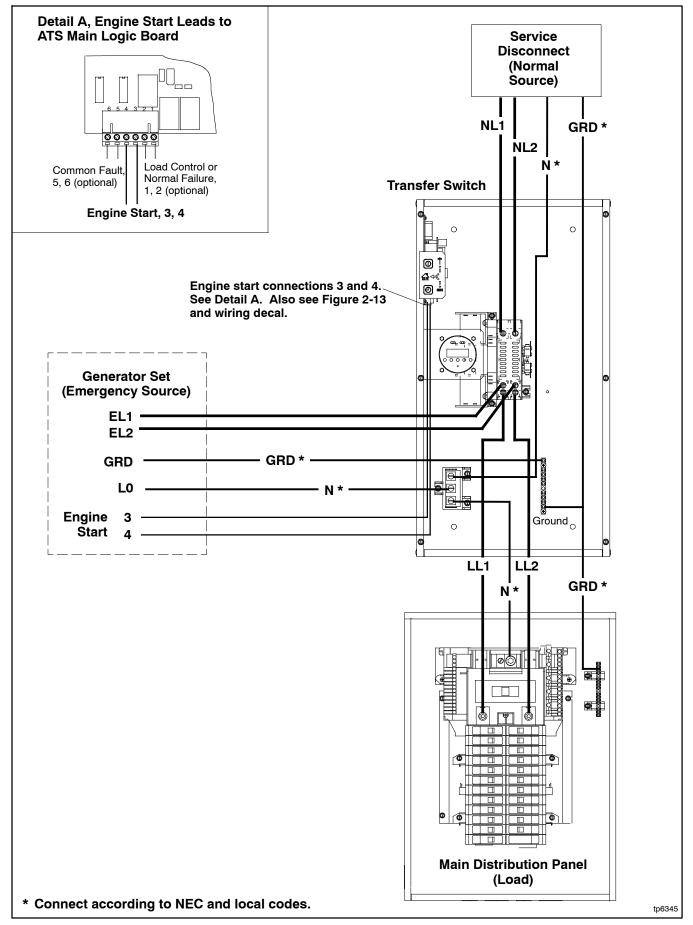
Connection Diagram, Transfer Switch without Load Center, Whole-House Configuration
